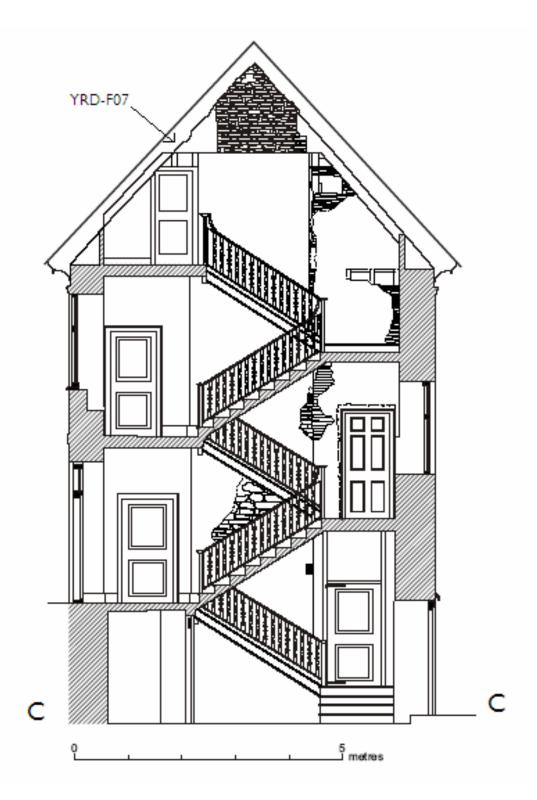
South range; east facing section C–C, showing the location of sample YRD-F07 (John Allan, location of section marked on Fig 8)
